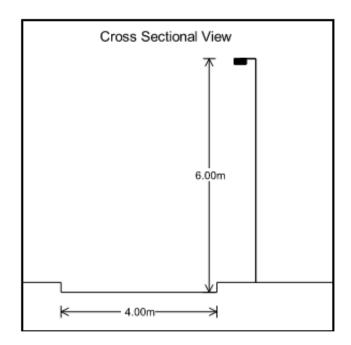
Illumination levels at South site entrance road (Lighting Reality Hollystown)
